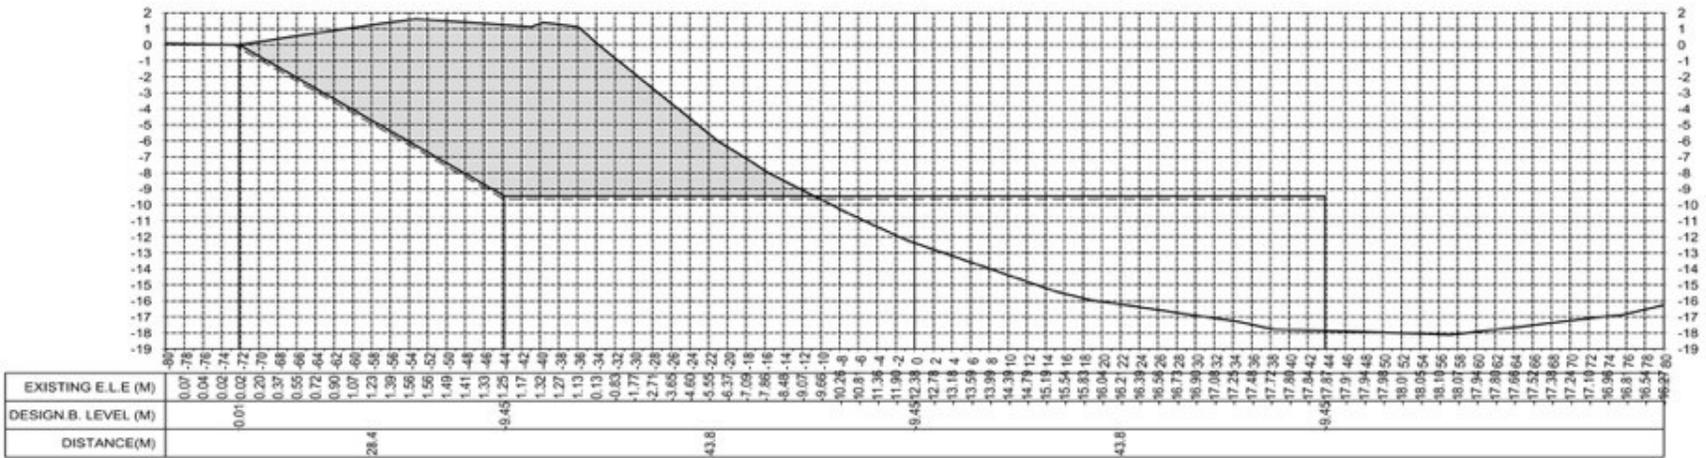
Typical dredging cross section of Tac Cua river (straight segment and bend correction)
